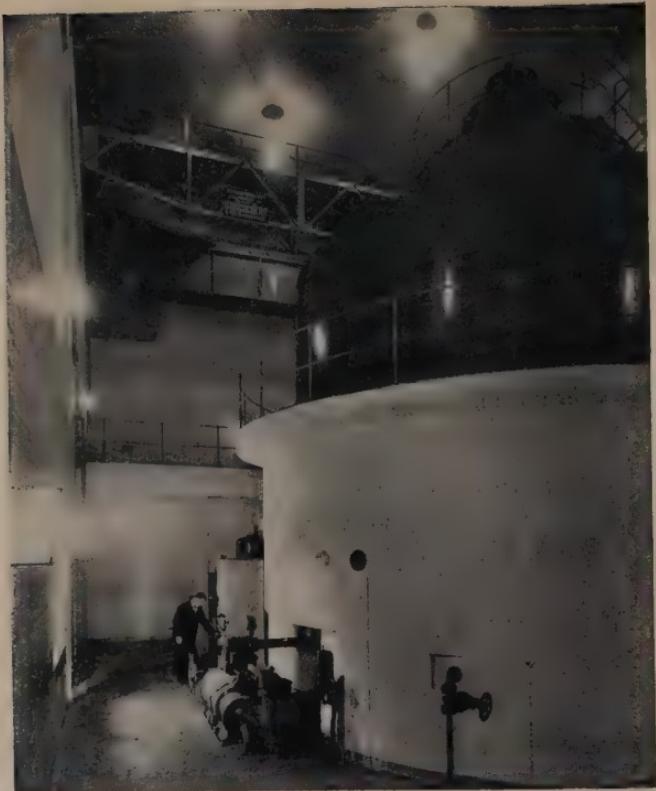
CLACHAN GENERATING STATION. INTERIOR VIEW LOOKING TOWARDS UNLOADING BAY
